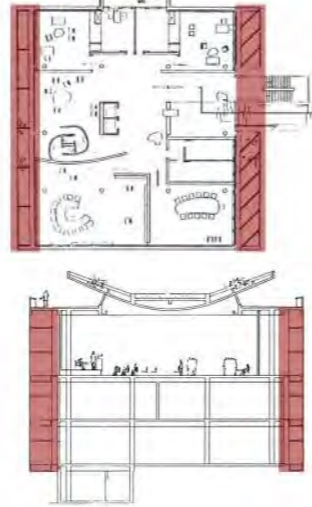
Above: Mill Owners' Floor Plan and section, showing brise-soleil porous/enclosing elements (Author 2018).
